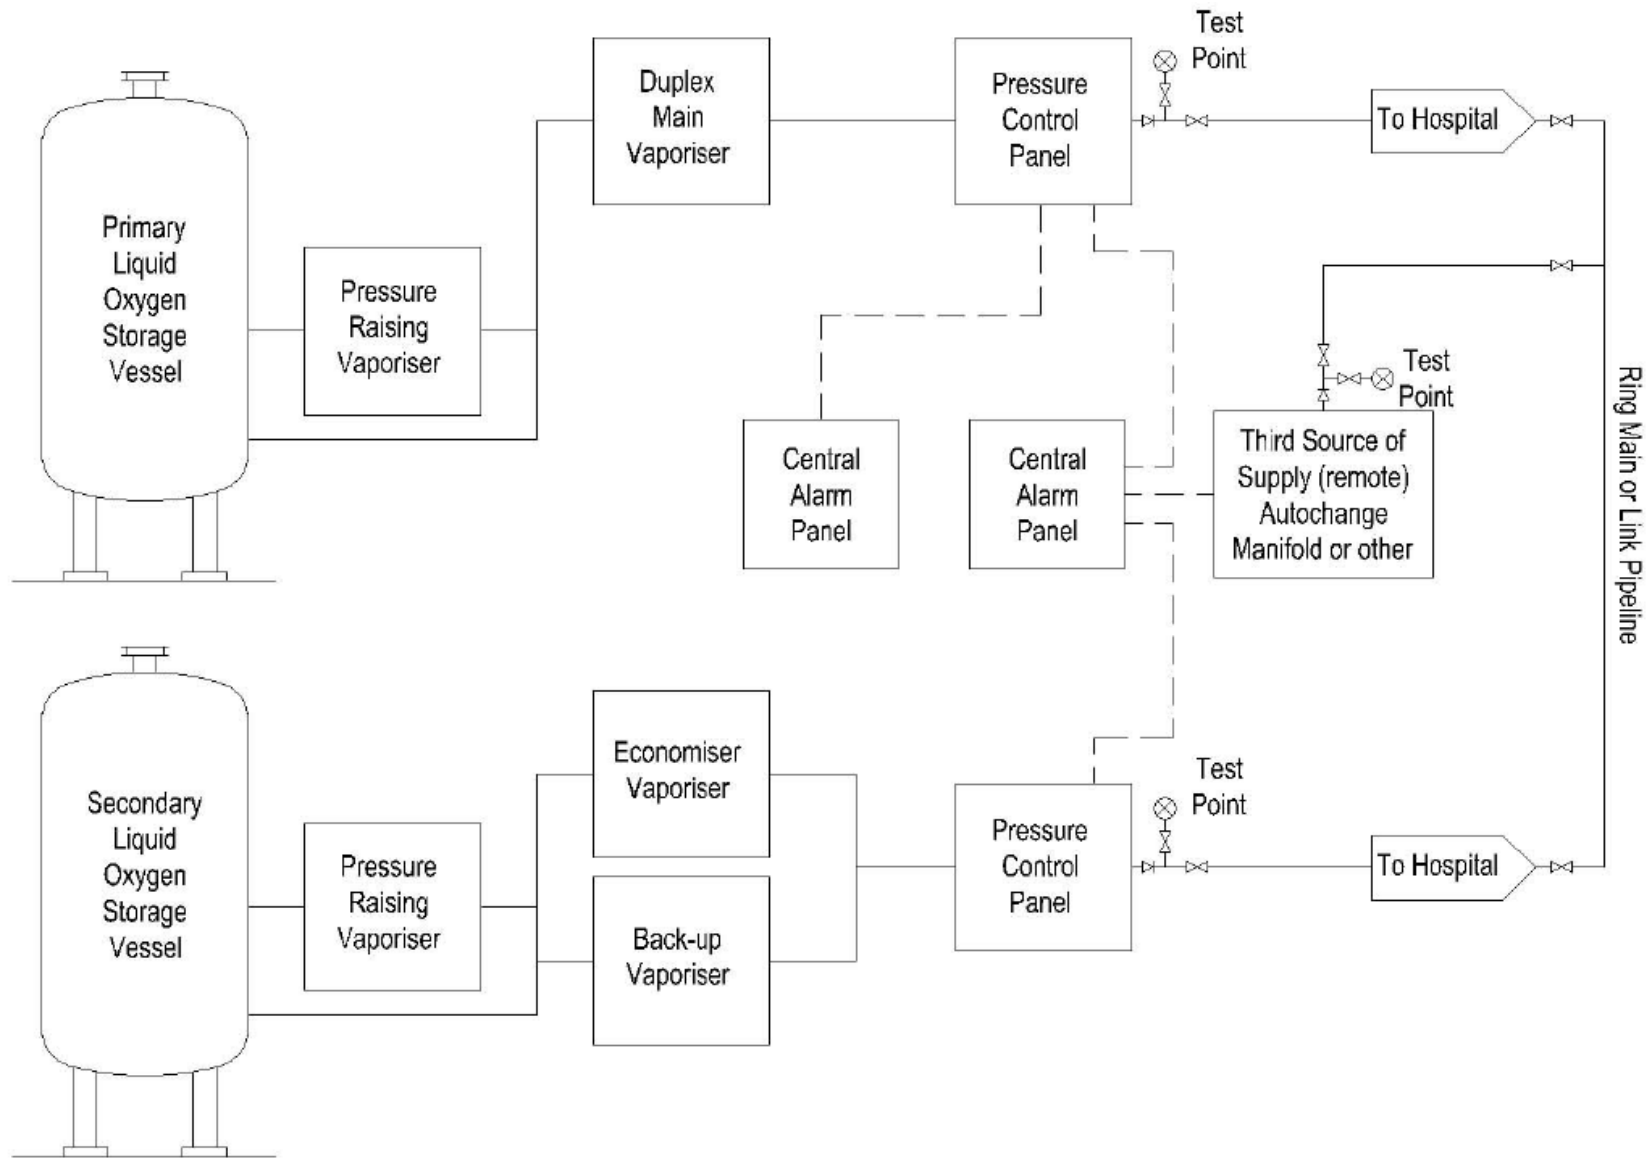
Primary and secondary supply VIE system on separate plinths with remote third source supply compressed gas cylinder manifold
